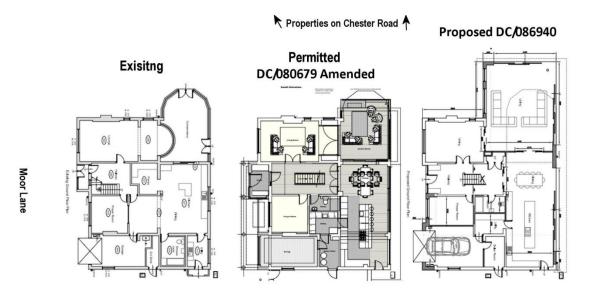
Comparison of first floor plans for existing, permitted amended and new proposals
